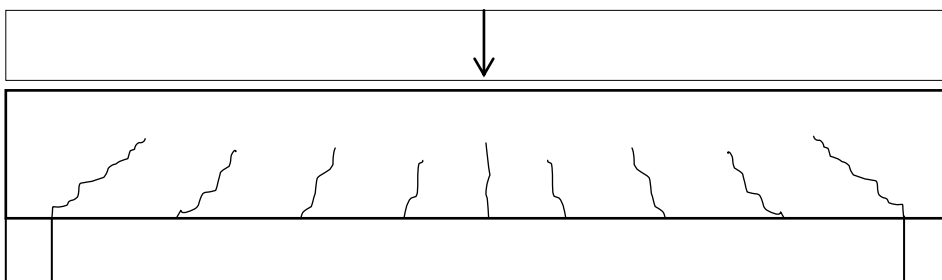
Cracking in a concrete beam due to moment and shear.
